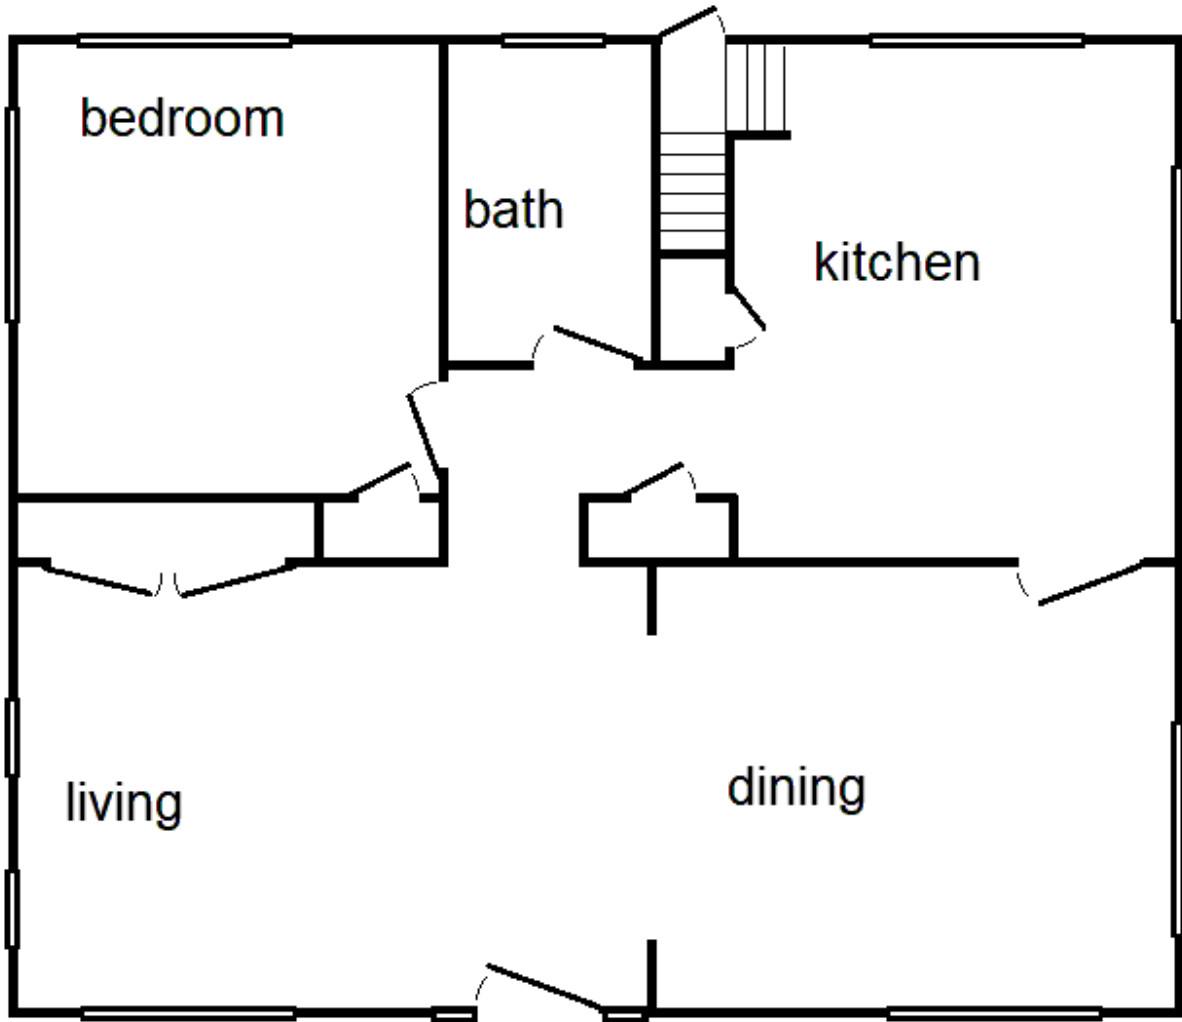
Speculative original floor plan of side-gabled house, based on 7640 Santa Monica Avenue and 7607 San Diego Avenue (both of which have been remodeled; 7640 Santa Monica also has extensive fire damage). Not to scale. Drawing by Lynn Josse.
